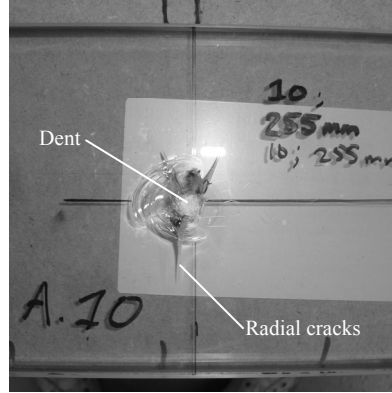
Frontal view of side impact in 2.PVB.A specimen. Besides a dent, some radial cracks appear.
